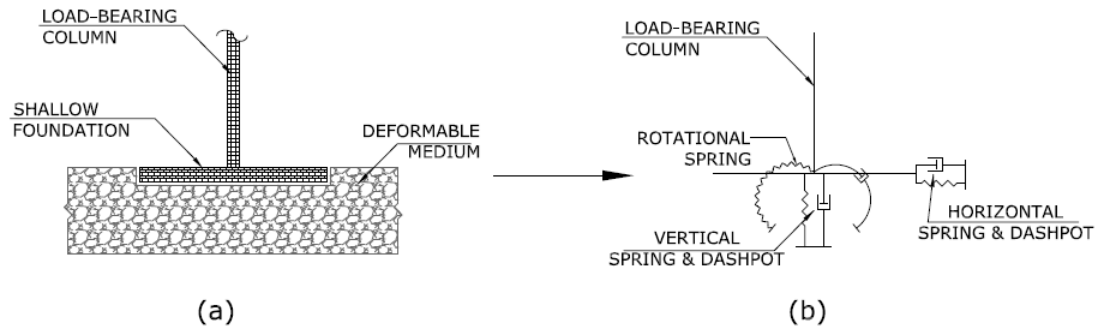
(a) Actual foundation system (b) Single point springs system
